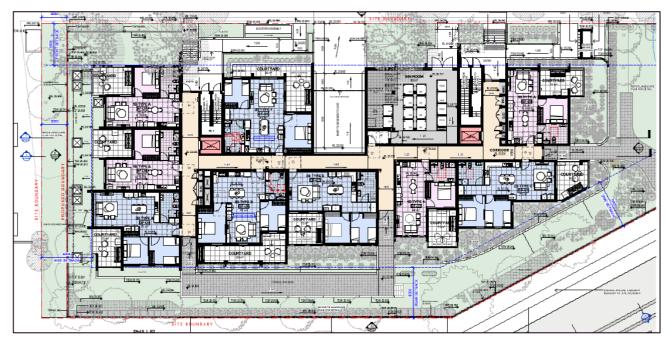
Site/ground floor plan. Source: WMK Architecture, dated 18 October 2024
